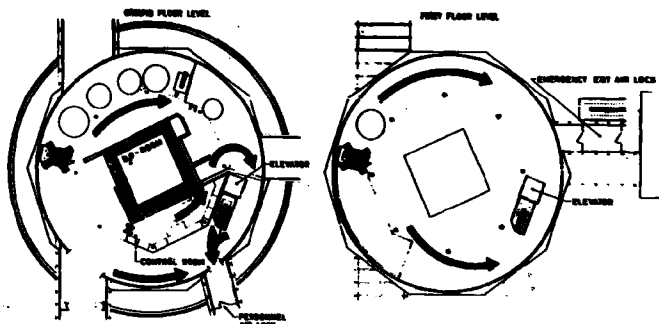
Preferred evacuation routes, first floor and ground floor levels.
